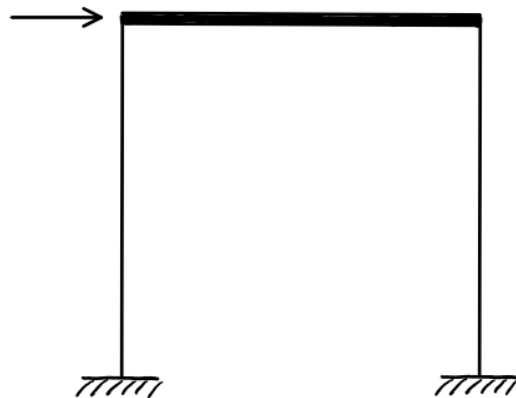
Fixed base portal frame where the beam is significantly stiffer than the columns subject to a horizontal load in the top left corner.
